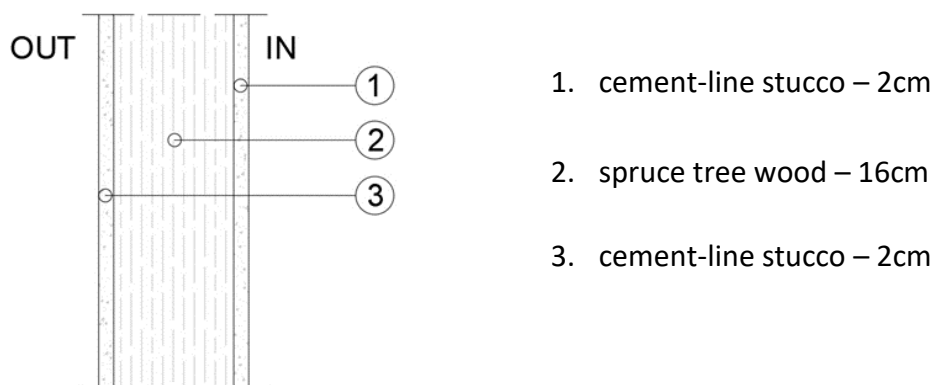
Bondruk wall type 1. (adapted Hadrović 2017)
